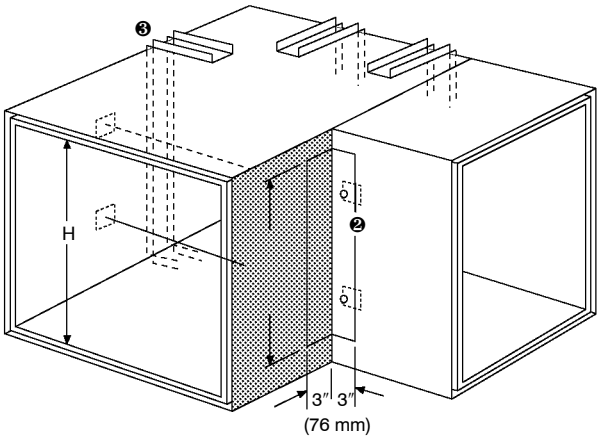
SHEET METAL ANGLE AT THROAT LARGE 90-DEGREE ELBOWS
